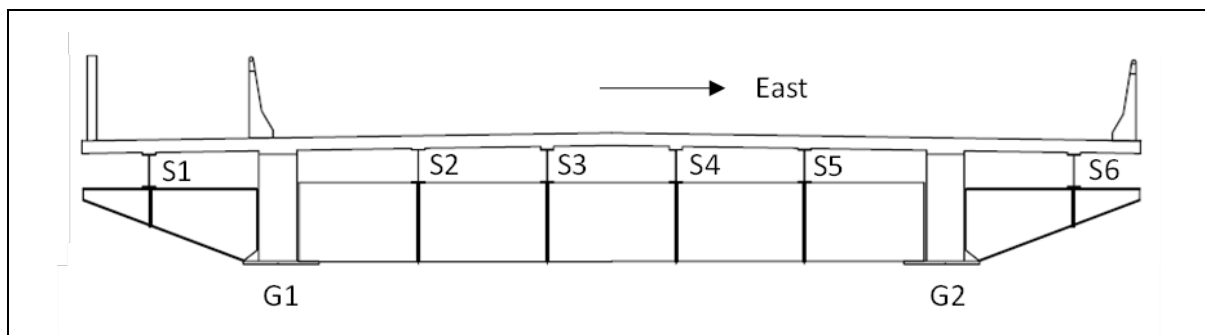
Bridge orientation and numbering – stringer (S) and girder (G) layout.
